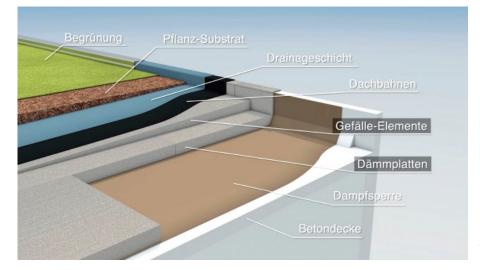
Single-layer flat roof – schematic construction of a concrete slab
